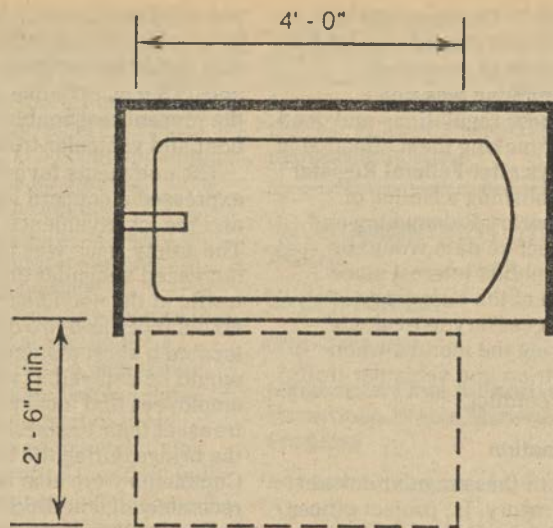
Alternative Specification – Clear Floor Space at Bathtub
